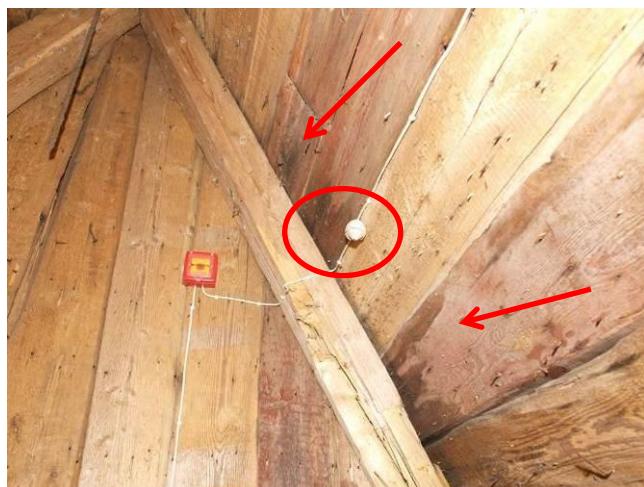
Roof boarding has marks of water passages and wasp's nest
